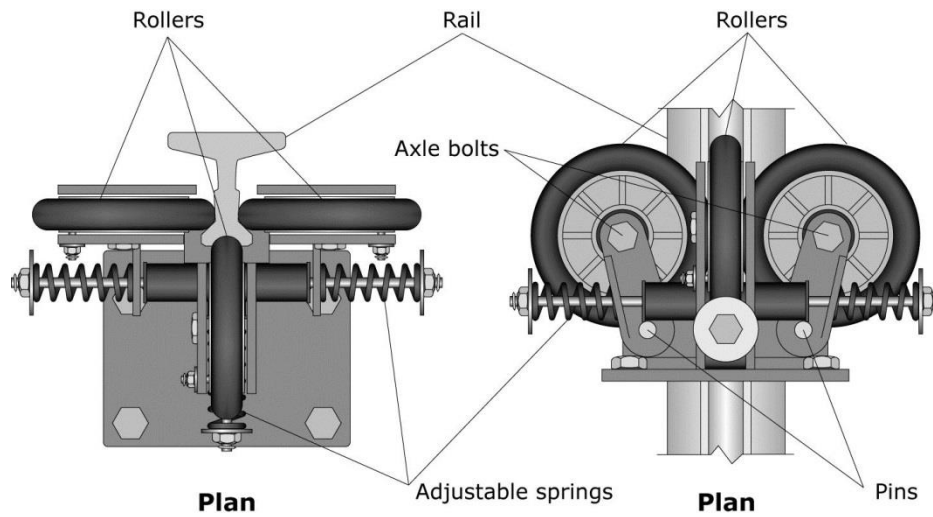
Spring loaded elevator guide with polyurethane rollers. Details of elevator guides vary from manufacturer to manufacturer, elevator load capacity, elevator speed, and whether used for guiding the car or counterweight.
